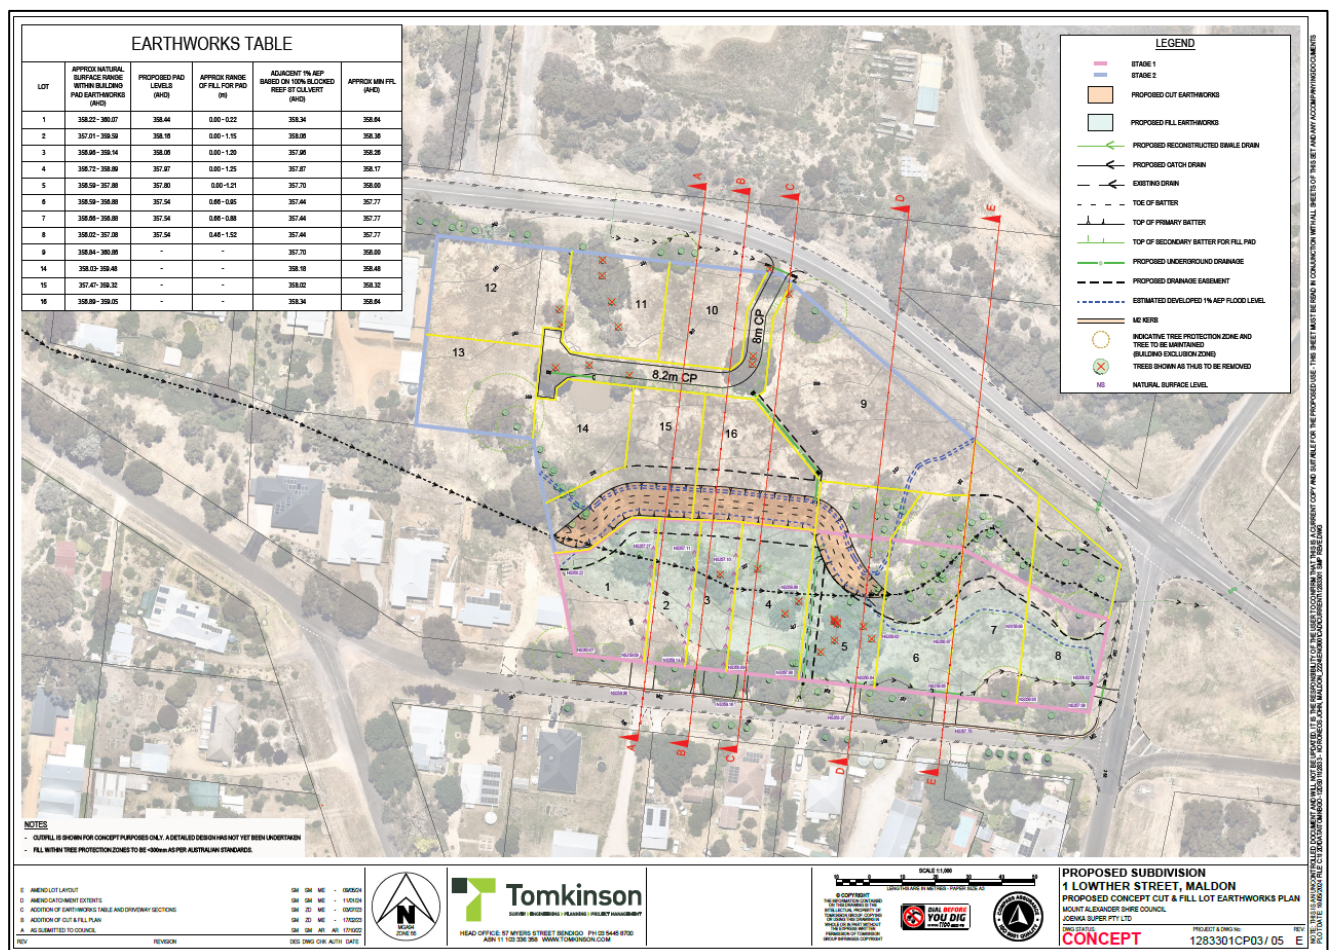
Earthworks plans showing proposed cut and fill taken from applicants Stormwater management strategy
